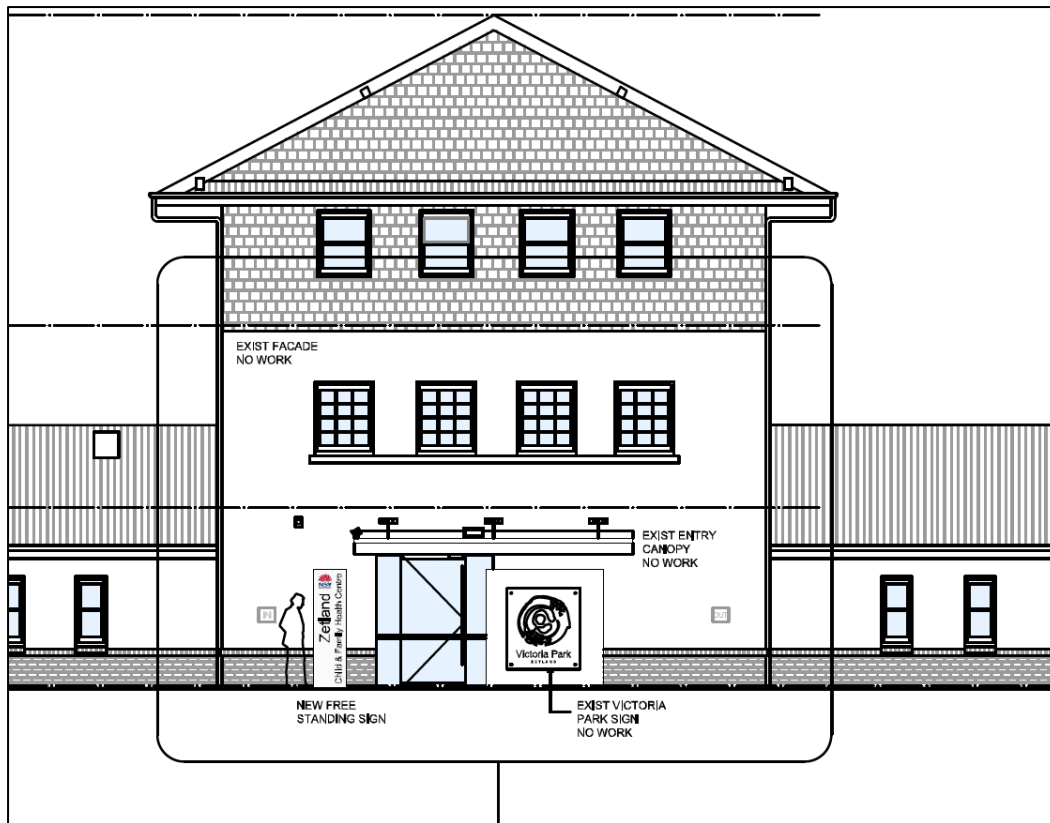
Proposed signage adjacent to the primary Joynton Avenue entry. It is noted that the existing 'Victoria Park' sign adjacent to this entry is not proposed to be modified.
